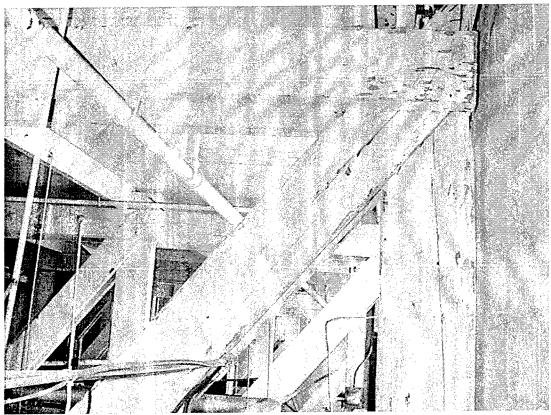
Fractured diagonal member BZ of Truss 27, Area A.
